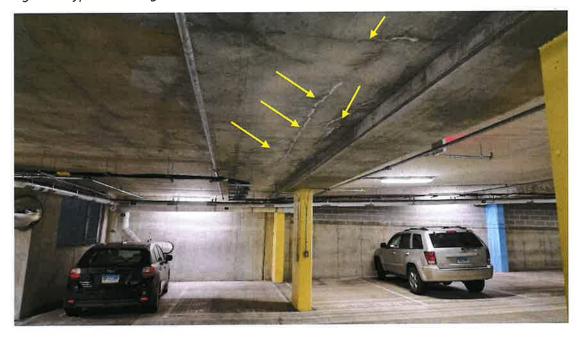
First Level of Garage. Note Shrinkage Cracks with Efflorescence at underside of 2nd Floor
